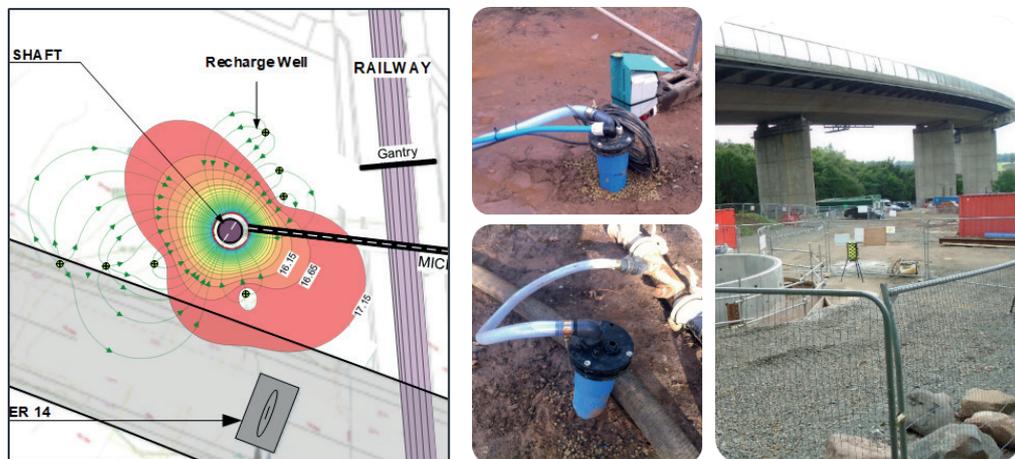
Combination of abstraction & recharge wells to dewater shaft and prevent settlement of road bridge.
